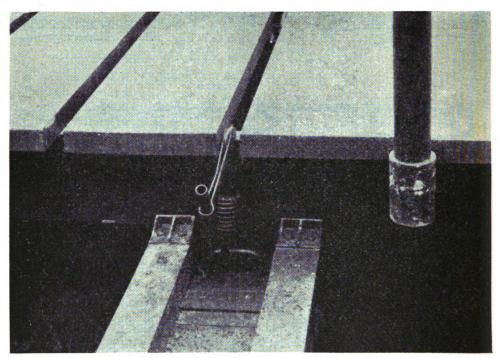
Duckboard fastened to float. (Note handrail post attached to duckboard stringer.)
